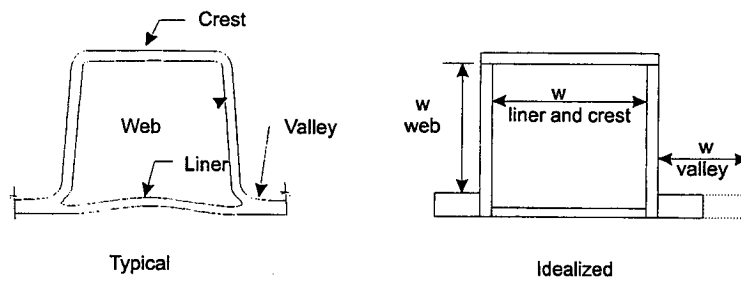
Typical and idealized cross-section of profile wall pipe.
